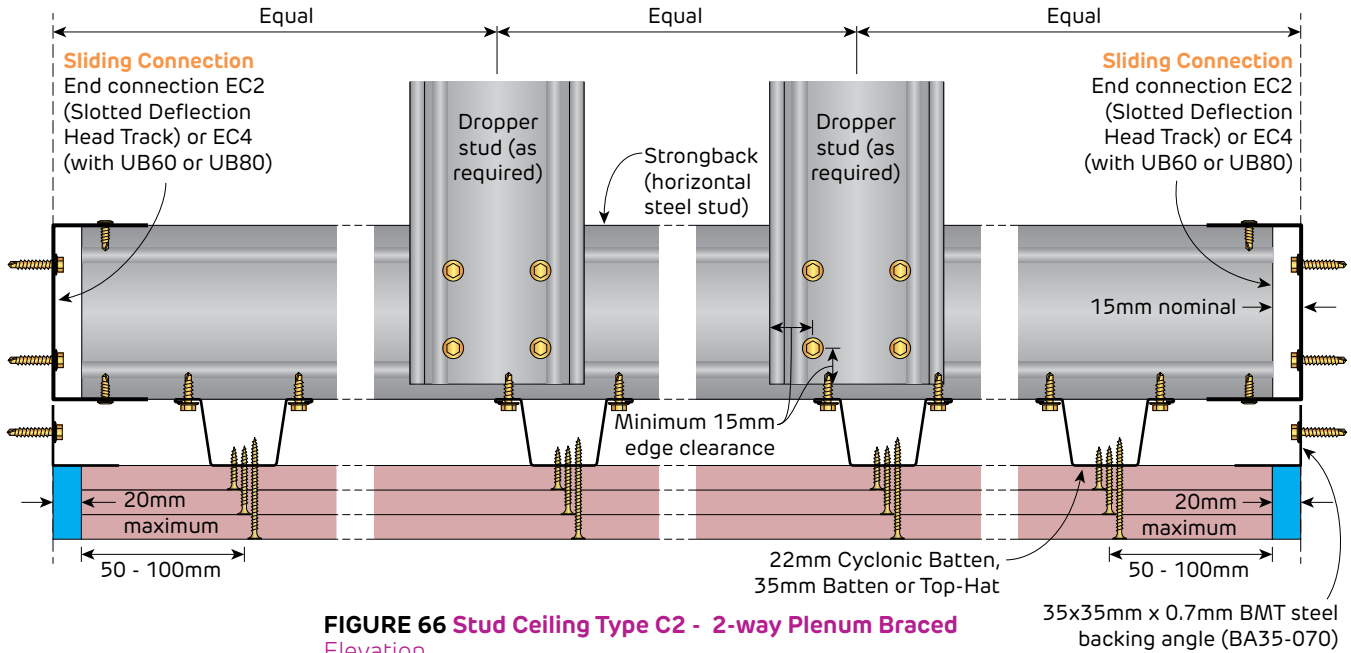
Stud Ceiling Type C2 - 2-way Plenum Braced
